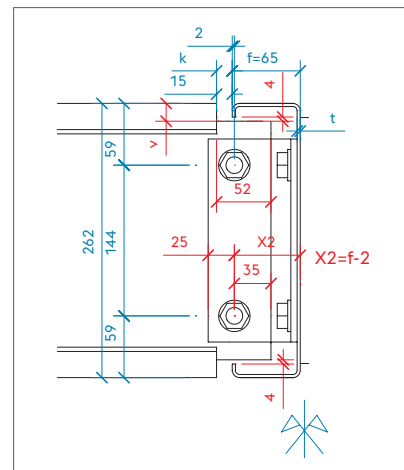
Example of a connection of a floor beam made of 262C+15 to a girder made of 262M25
